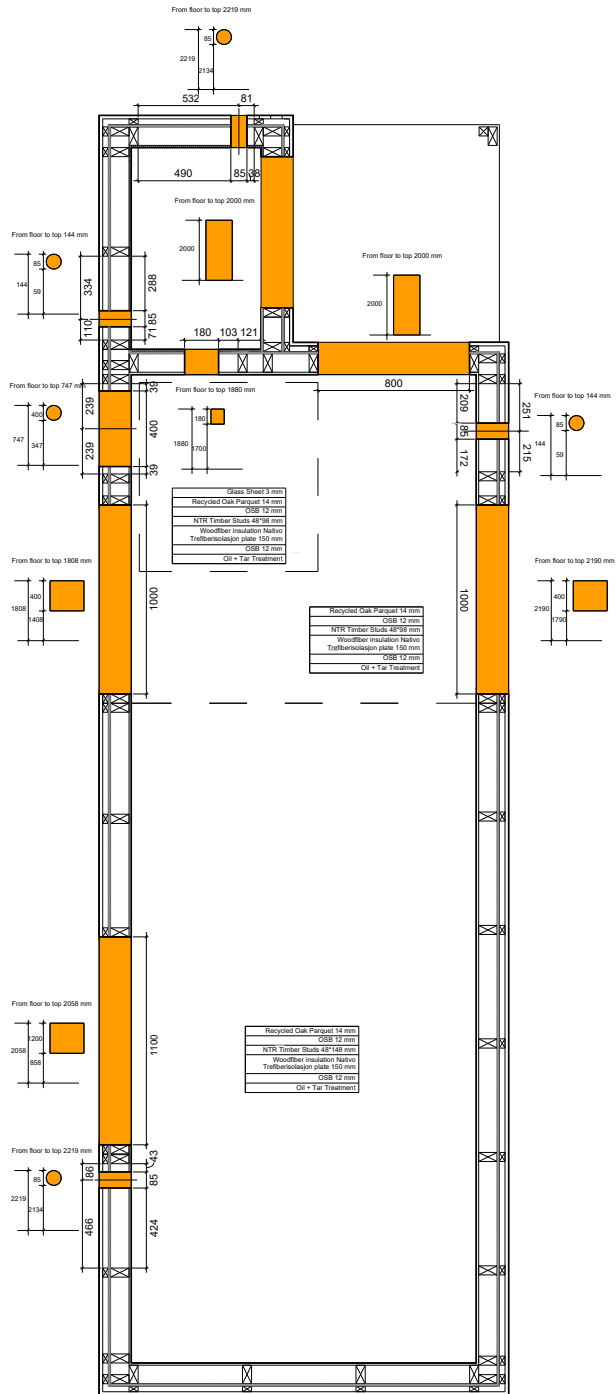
PLAN OF WALL'S OPENINGS. SCALE 1:40
